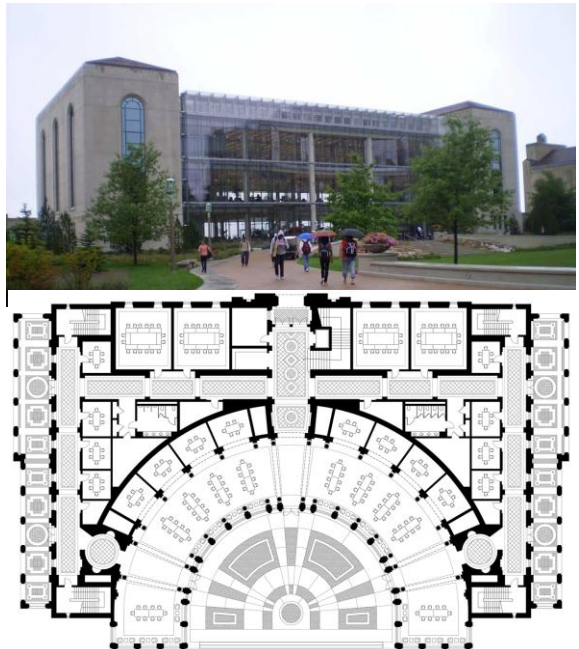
(Top) Subject Case: Loyola University of Chicago’s new Klarchek Information Commons (LEED Silver). Fig. 3b. Design Case: Proposed Ground Floor Plan. Image credits: John C. Mellor.
